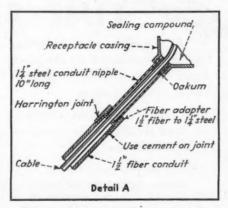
Moisture seal at receptacle housing and fibre-to-steel connections underground shown in detail.
